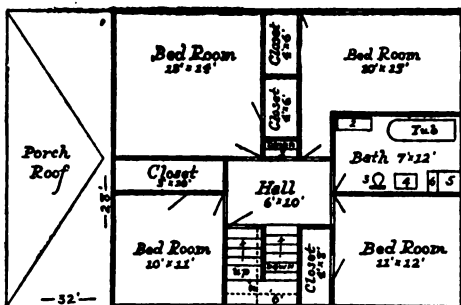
Second-floor plan of farmhouse shown in Fig. 480. A sleeping porch could easily be built outside the bedrooms. 2 is a linen closet. The chute (6) saves carrying soiled clothes to the cellar.
